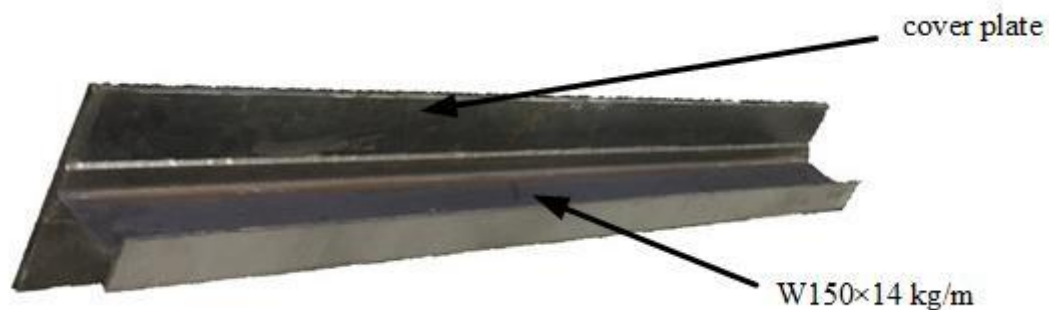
Beam specimen welded with steel cover plate.
